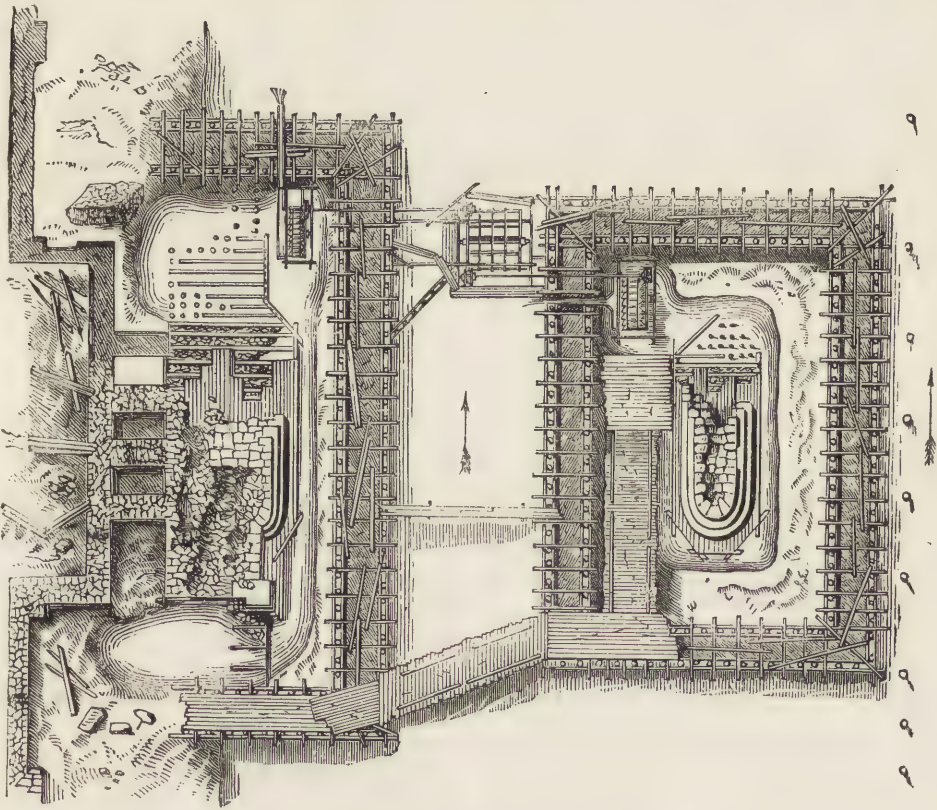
PLAN OF COFFER-DAM AT NEUILLY.
